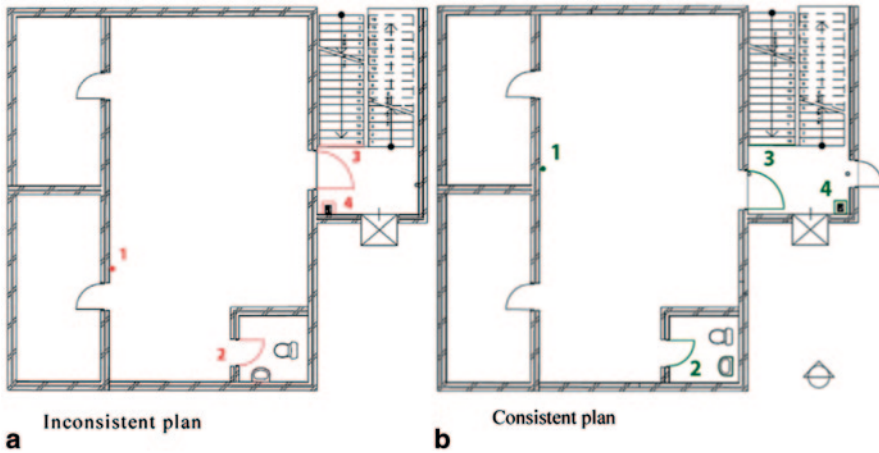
Design requirements: example spatial interpretations. a Inconsistent plan. b Consistent plan
